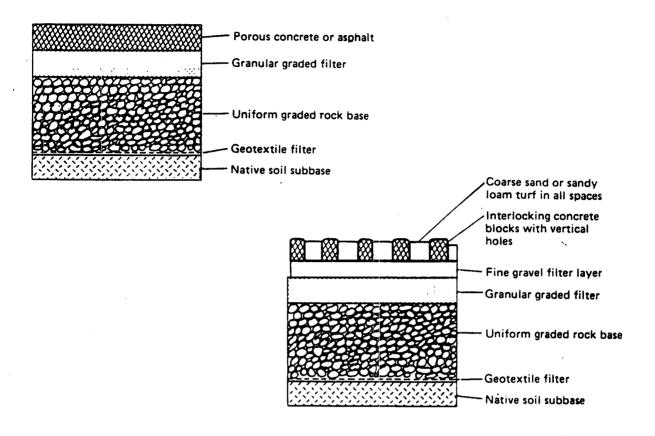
Cross-section porous pavement and cellular porous pavement (Urbonas and Stahre 1993).
